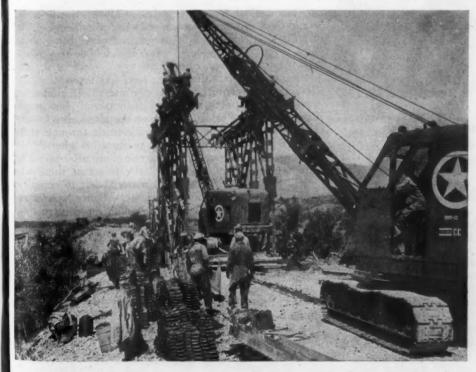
Erecting the Counter-Balance at the South Shore to Permit Cantilever Erection of the First Span
